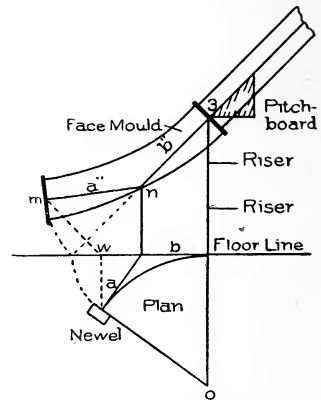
Developing Face-Mould, Obtuse-Angle Plan.
